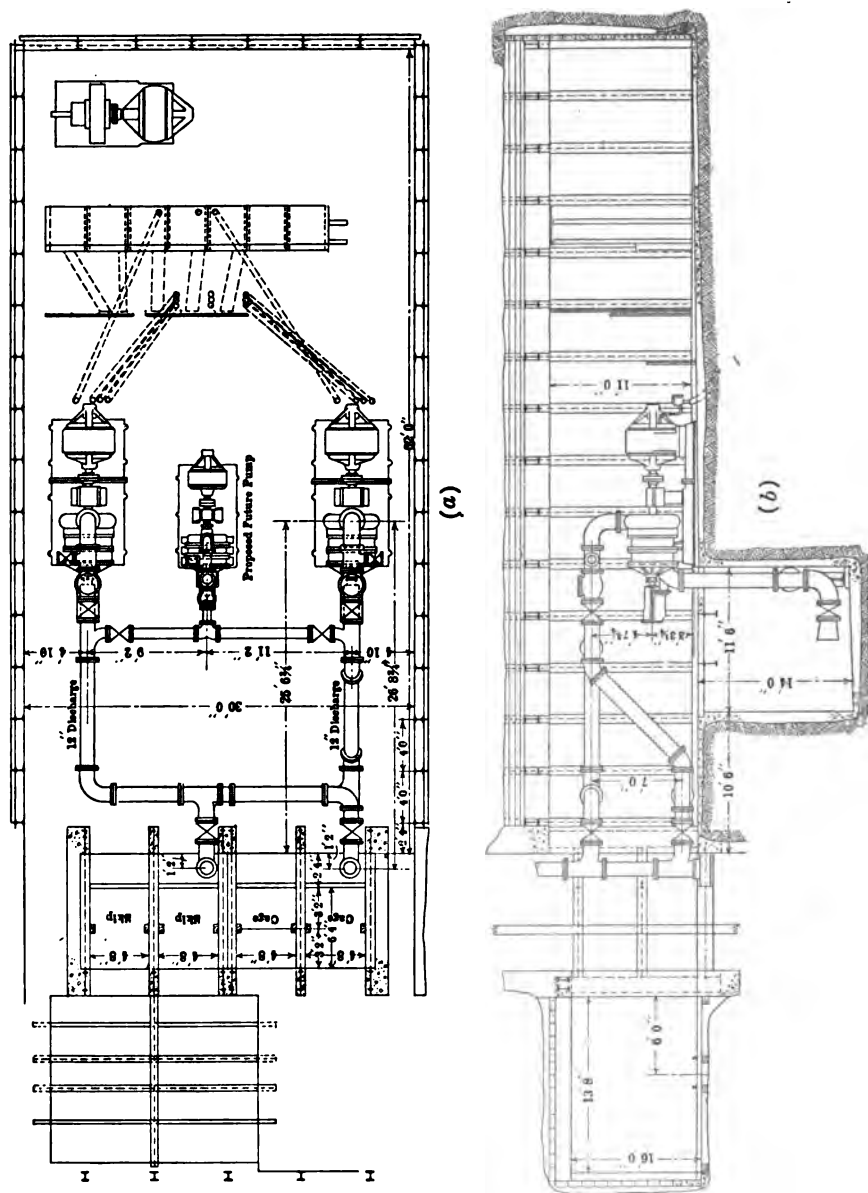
Plan and elevation of pump chamber. (Trans. A. I. M. E.)
